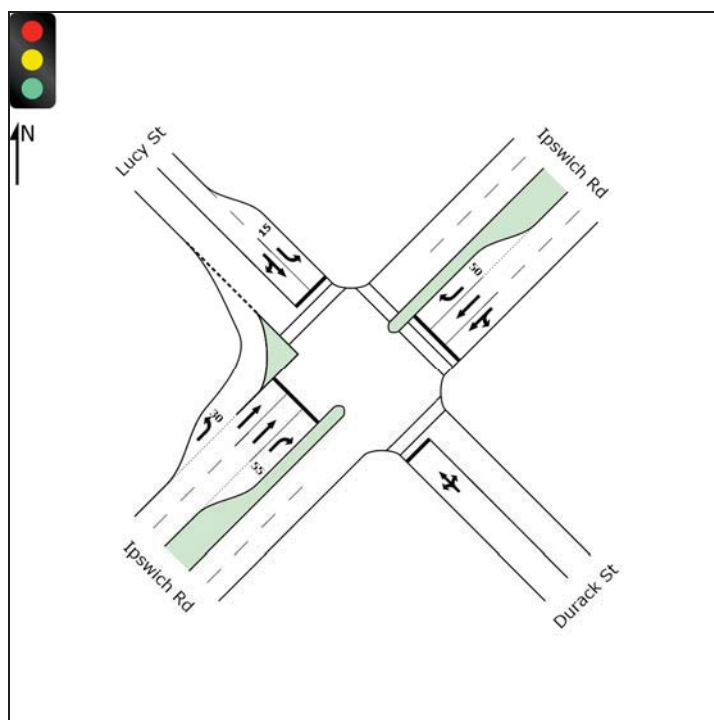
Ipswich Road/Lucy Street/Durack Street
